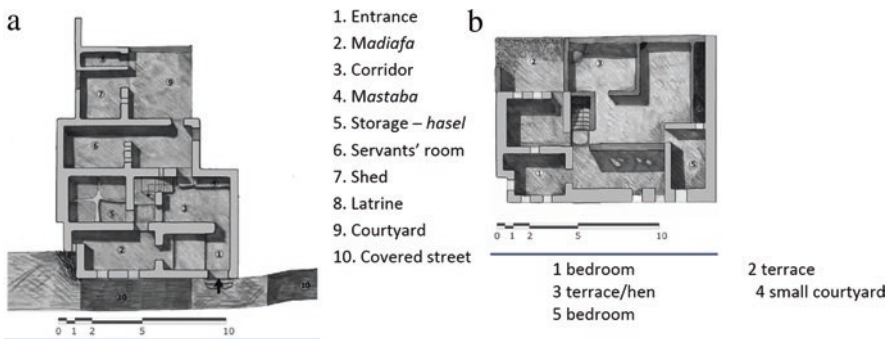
Al Qasr house. (a) Ground floor plan. (b) Roof plan. *Source:* De Filippi (2006)
